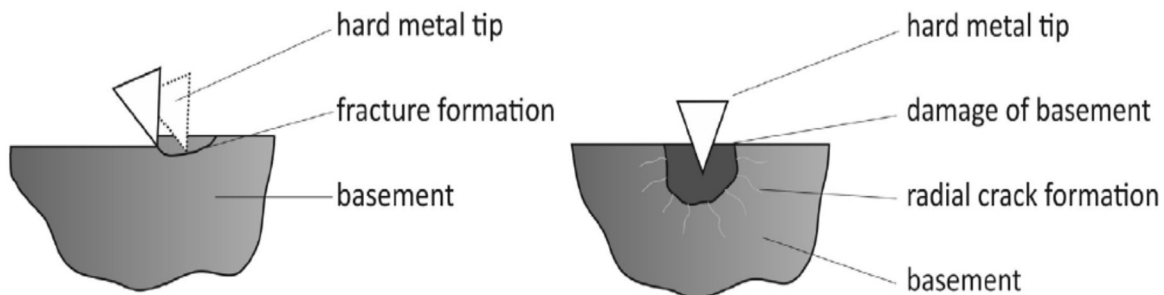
Hammer drilling schematic (Schwenn, M., 2021)
